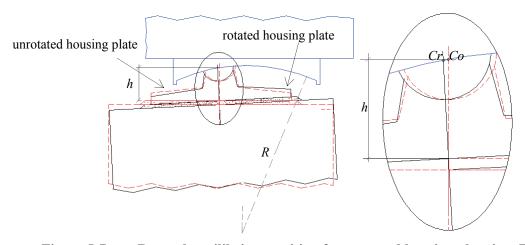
Rotated equilibrium position for a rotated housing plate in a FP bearing
